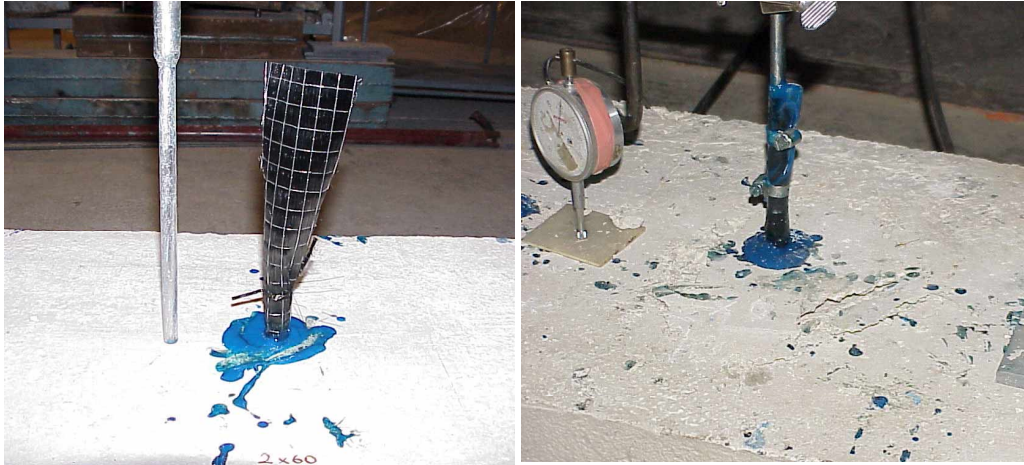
Anchor Dowel in the Concrete (Left), Anchor Dowel Bonded to Steel Rod (Right)
